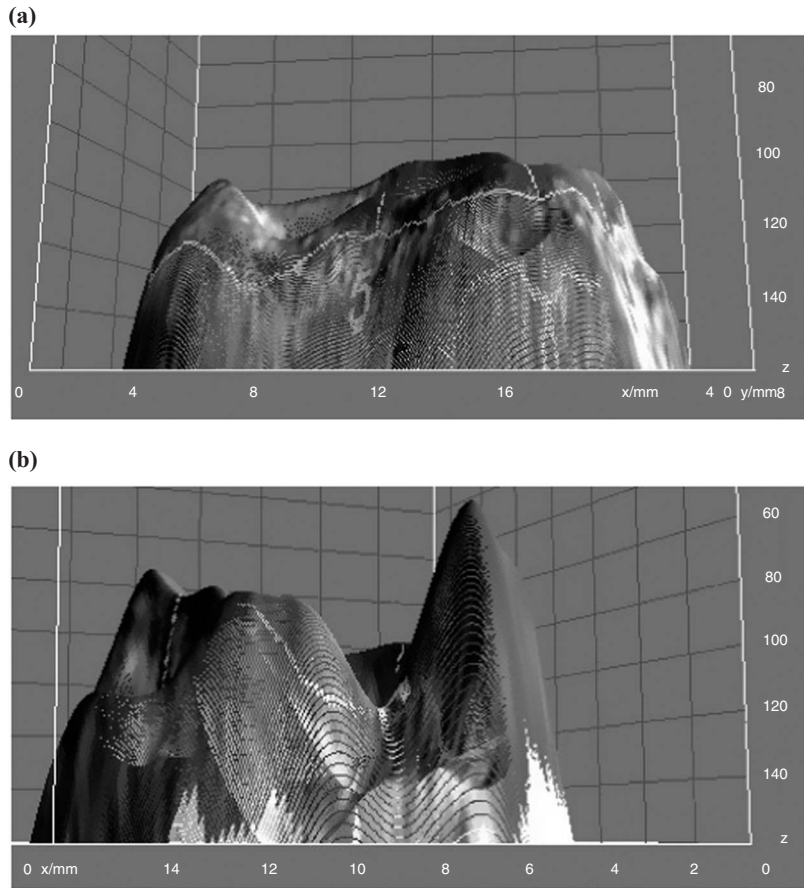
Typical view of pitting on (a) bare and (b) embedded specimen
